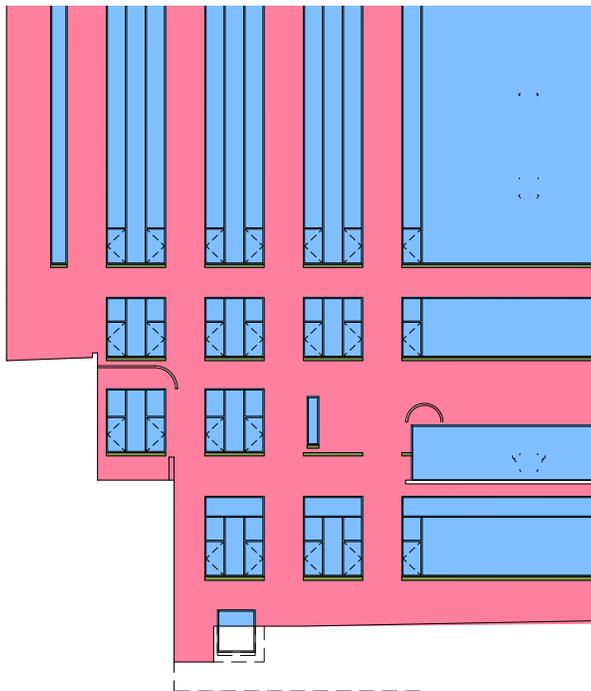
(6): North Courtyard: East-Facing Wall
